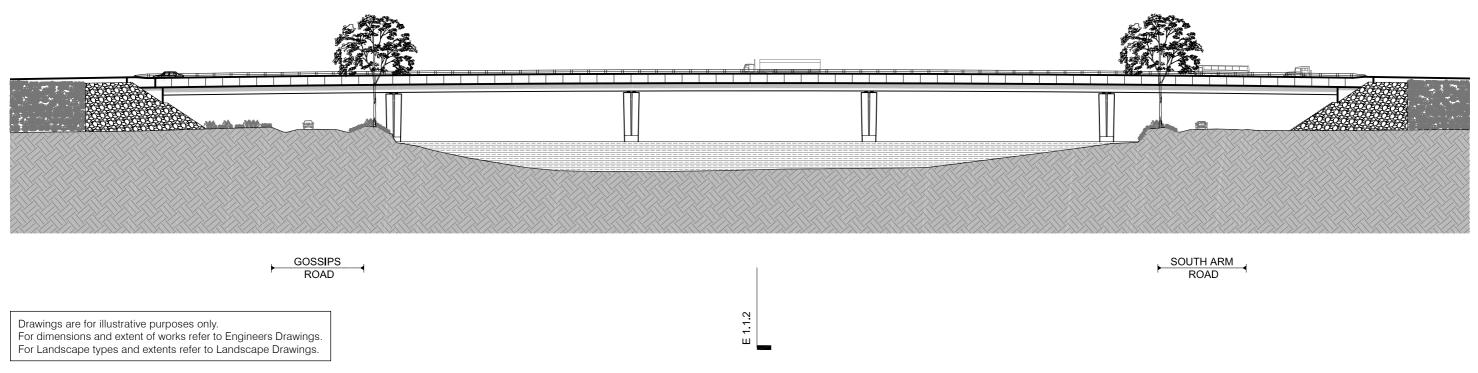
Twin Bridges over Kalang River: Elevation
